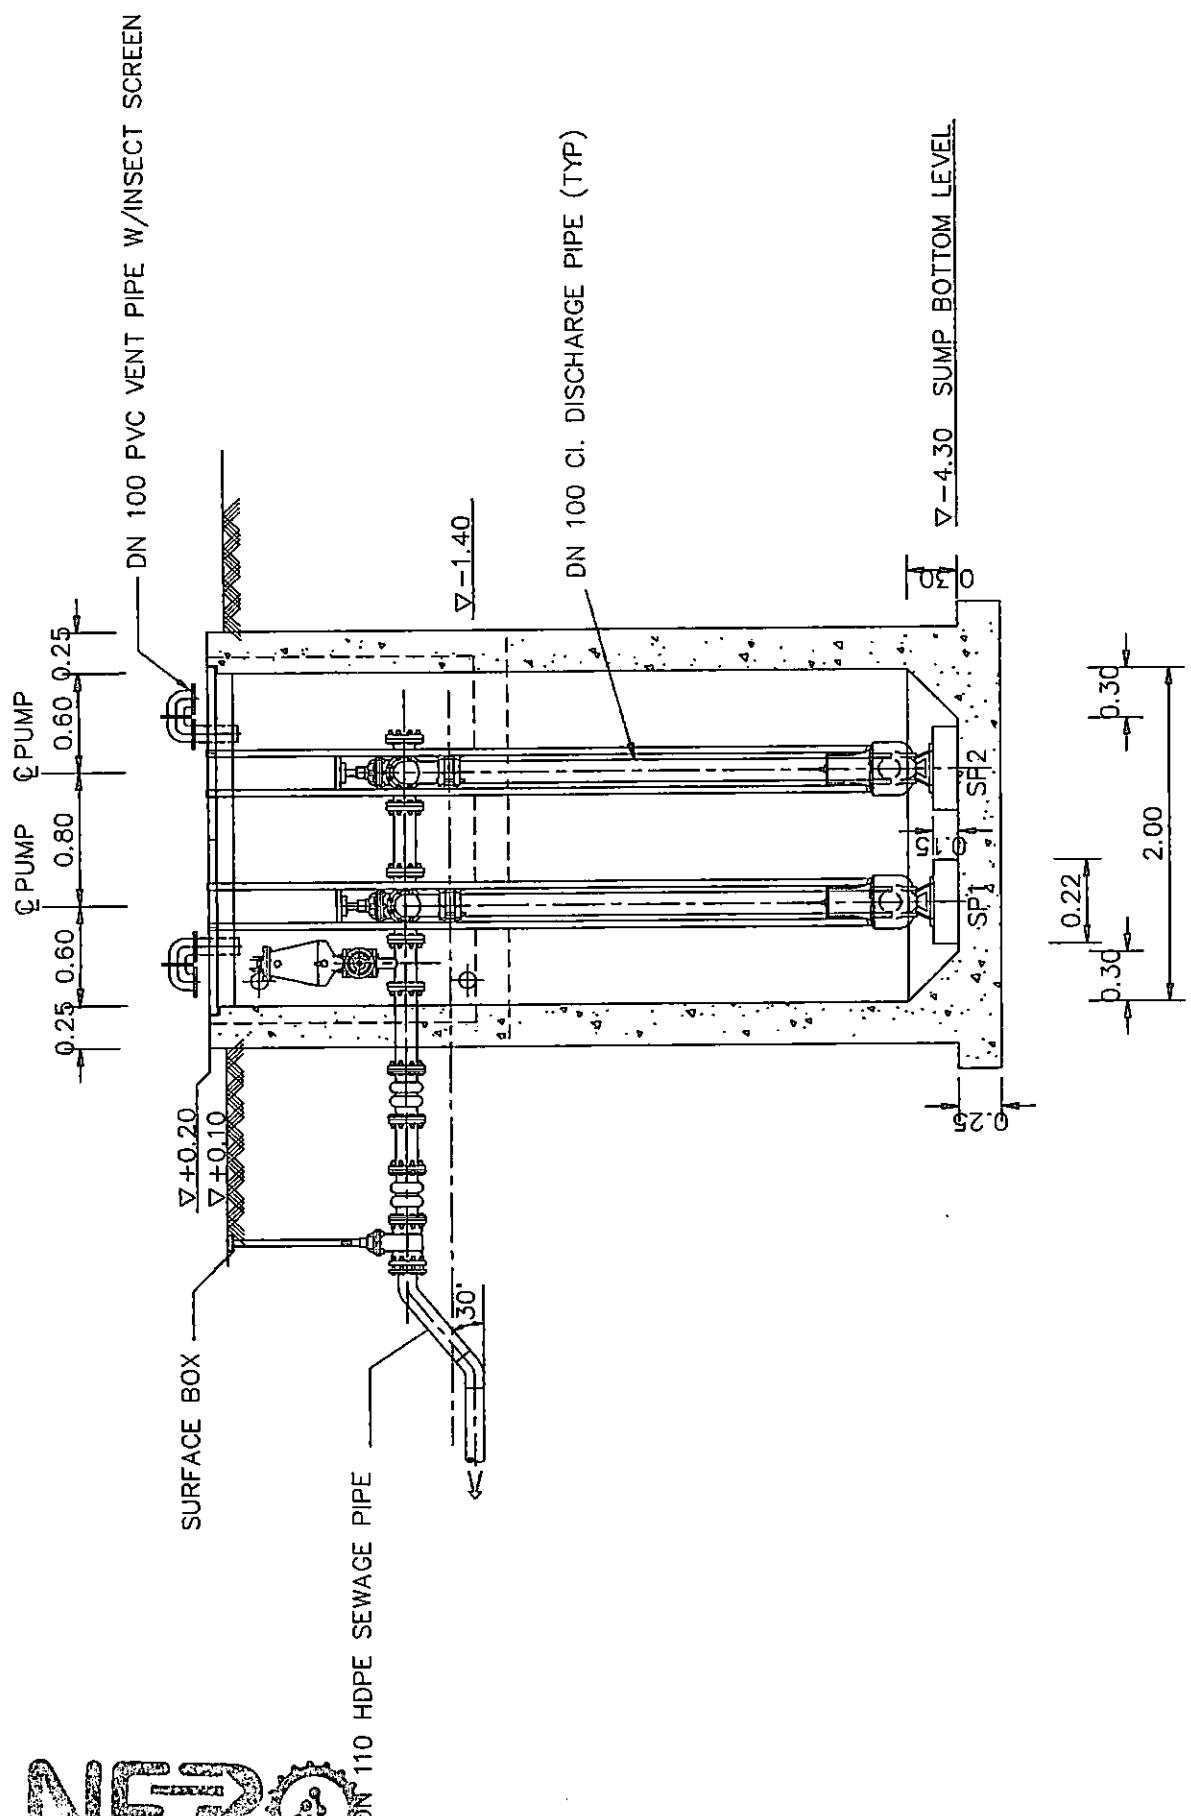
DETAIL OF PIPE CONNECTING AT SEWAGE PUMP PIT No. 1, 2, 14, 17, 18 & 19 PLAN
